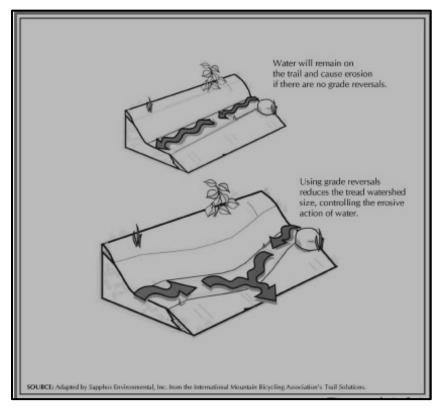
shows a Typical Grade Reversal for Trail Drainage.
